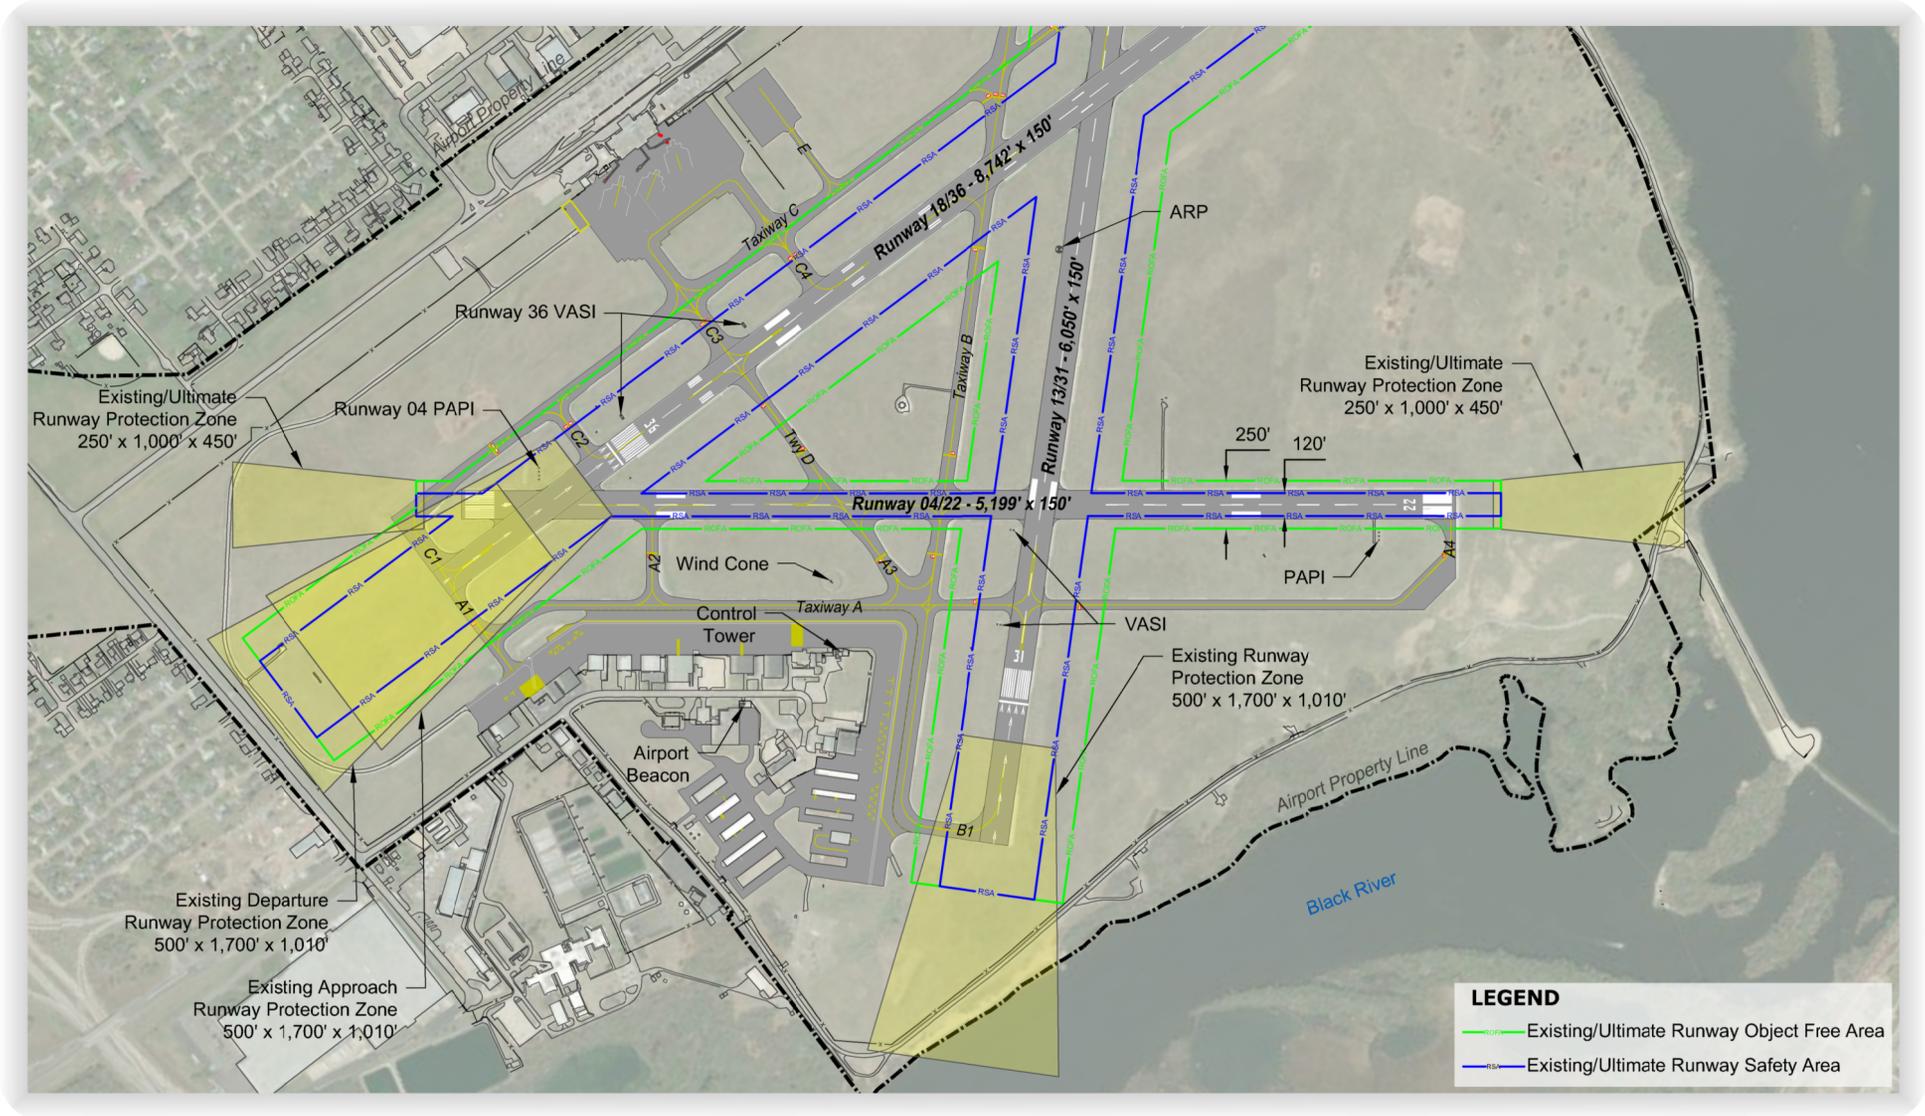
Runway 04/22: Alternative 1: Reconstruct Runway 04/22
